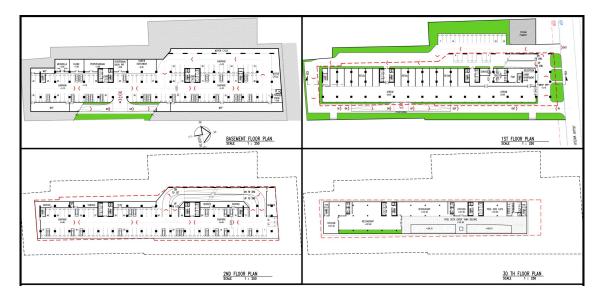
Building design of apartment with office building in the 1<sup>st</sup> scenario
